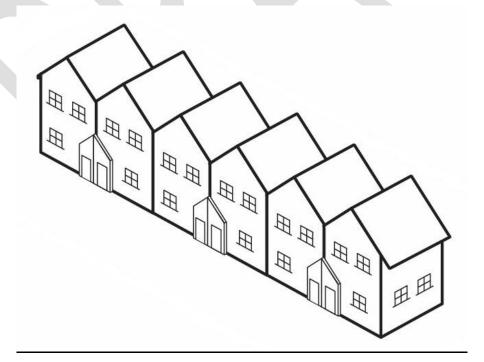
D: TOWNHOUSE CONTAINING SIX PRINCIPAL DWELLING UNITS
